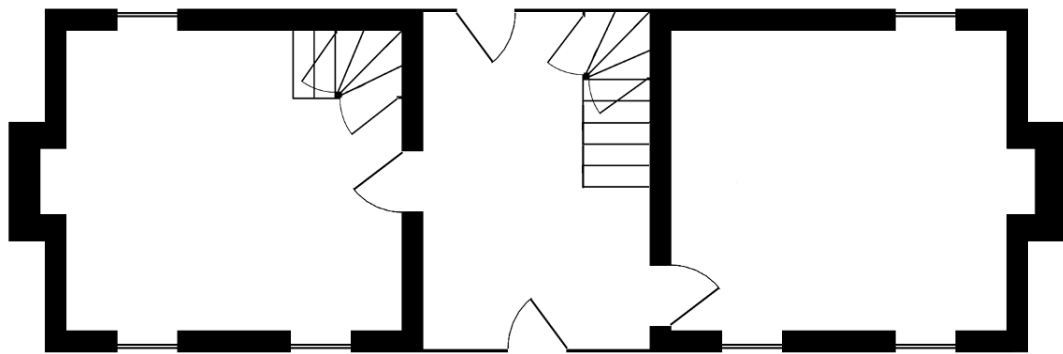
Floor plan of Polly's house, MN 685. There may well have been a wall dividing the room between the two doors. The House has a full cellar underneath accessed by the bulkhead stair near the stove flue on the left side of the building. Drawing from author's field notes. See also Figure 150.
